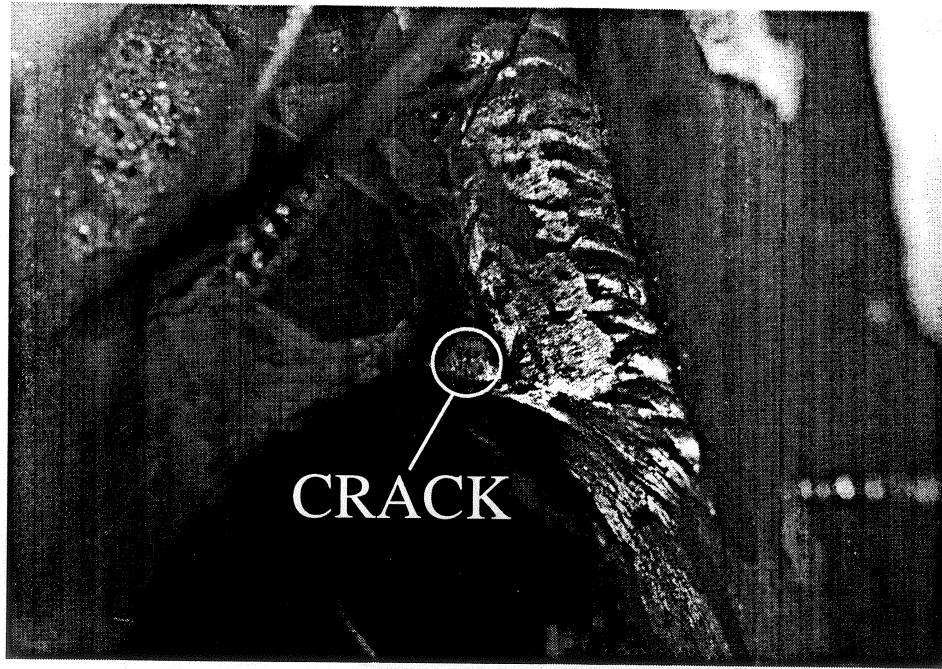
Crack on Northern Face of Diaphragm on East Side of Rib 7
